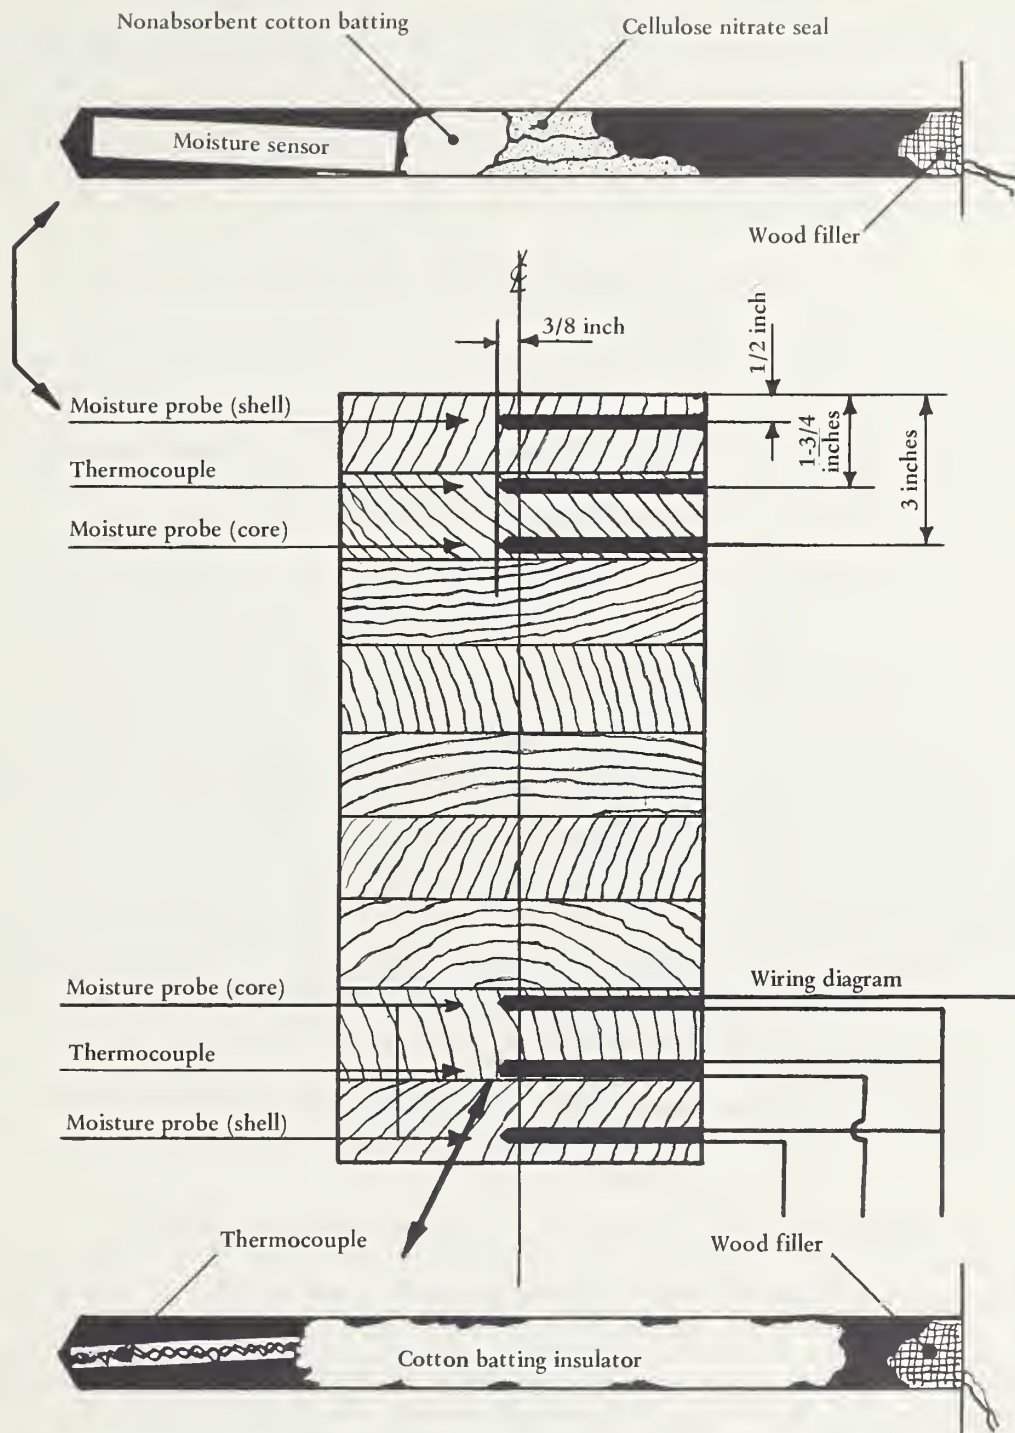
Typical section showing placement of moisture probes and thermocouples and method of installation.
